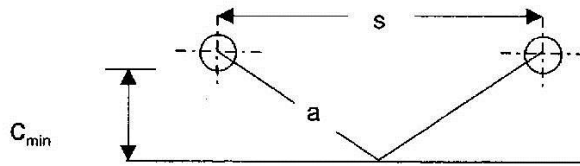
Distance from surface crack to centre of bar for slab or wall section
